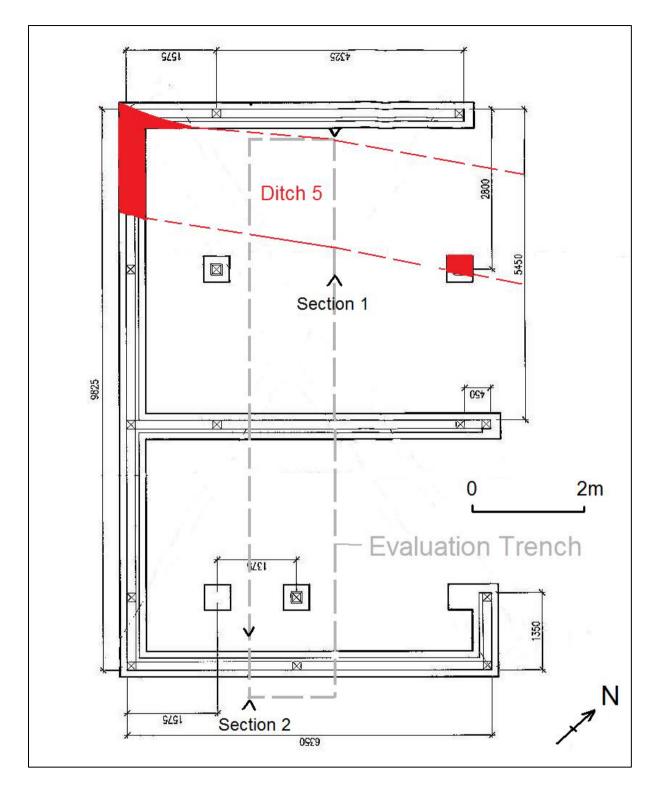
The Granary, Chiddingly Place: Site plan showing garage footings, location of evaluation trench and Ditch 5.
